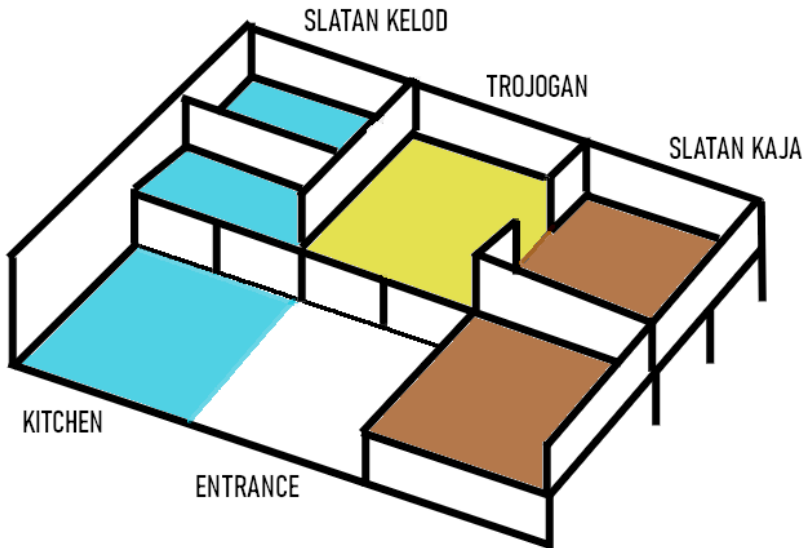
Schematic plan of a Bali Aga house [Source: Tjahjono]
